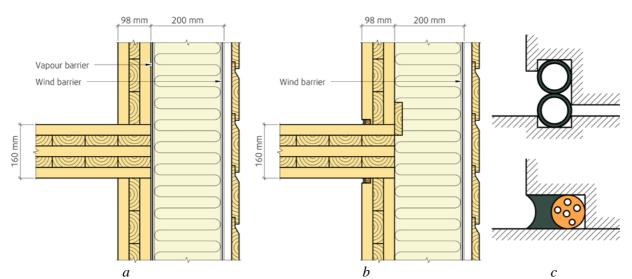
Cross section of CLT construction with separate water vapor barrier and wind barrier (a), and local sealing of joints between floor and wall elements with separate wind barrier under a ventilated wooden cladding (b). Examples of local sealing with rubber molding or sealing compound.
